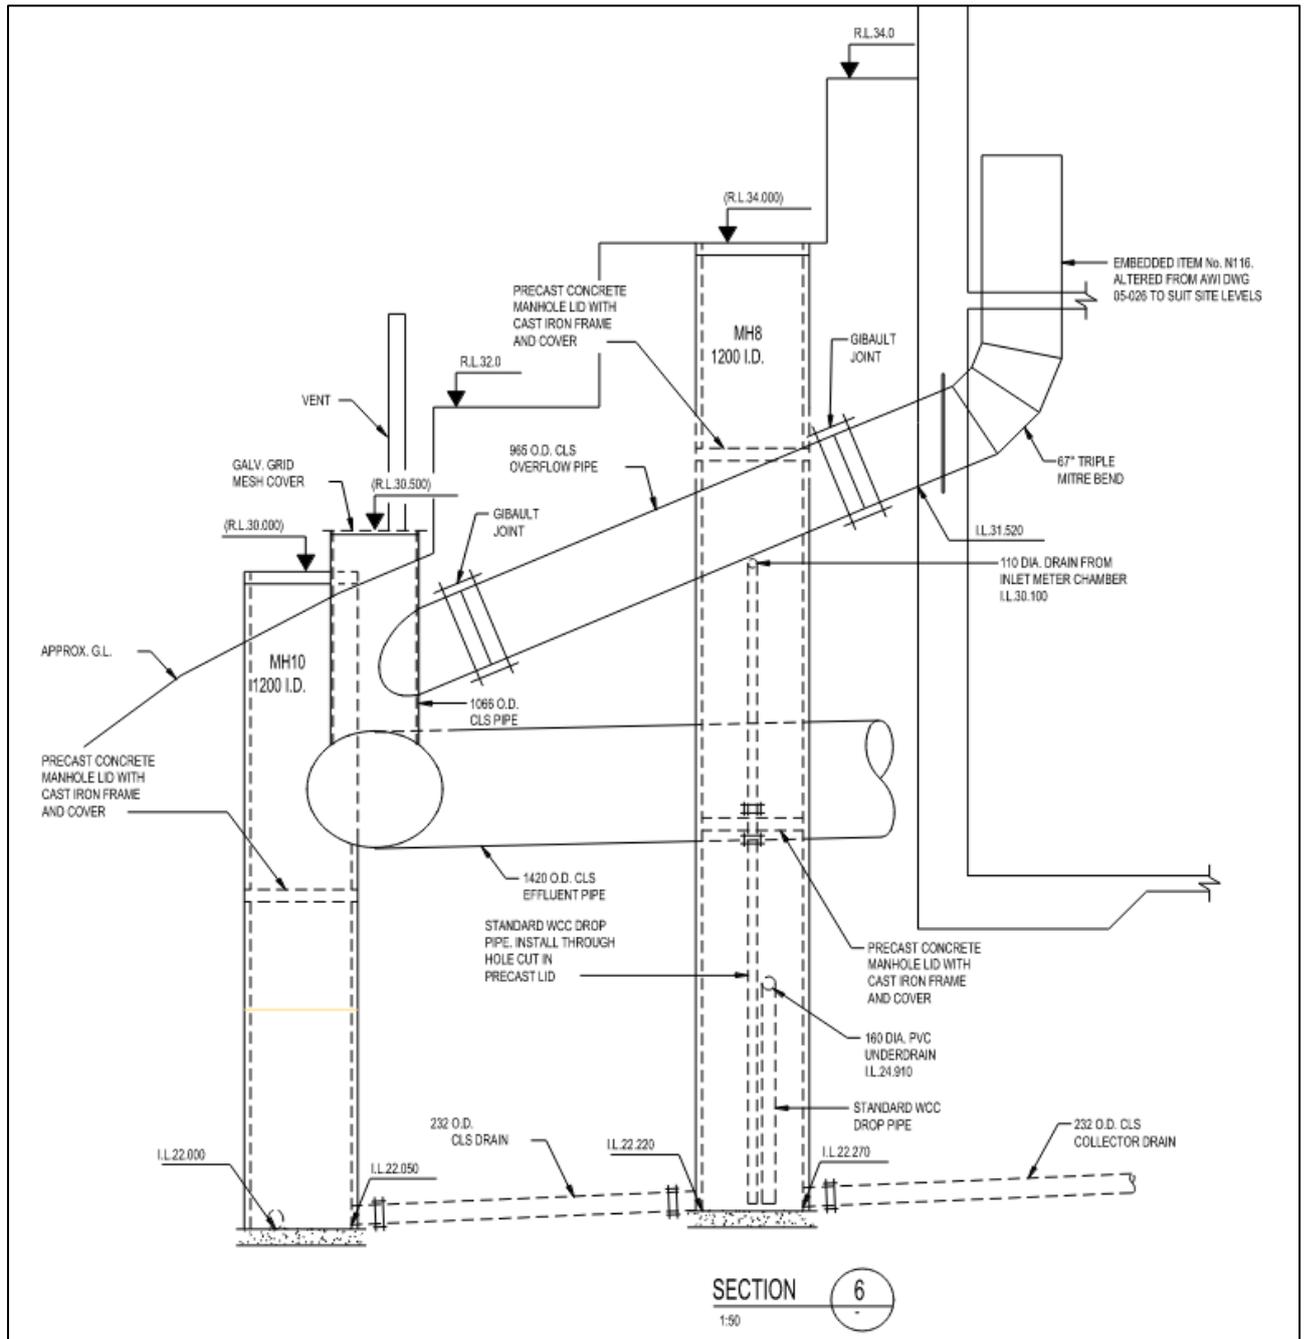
Elevation of Bypass Pipeline Connection to Effluent Pipeline (Extracted from Moa Pt WWTP As Built 02-535)
